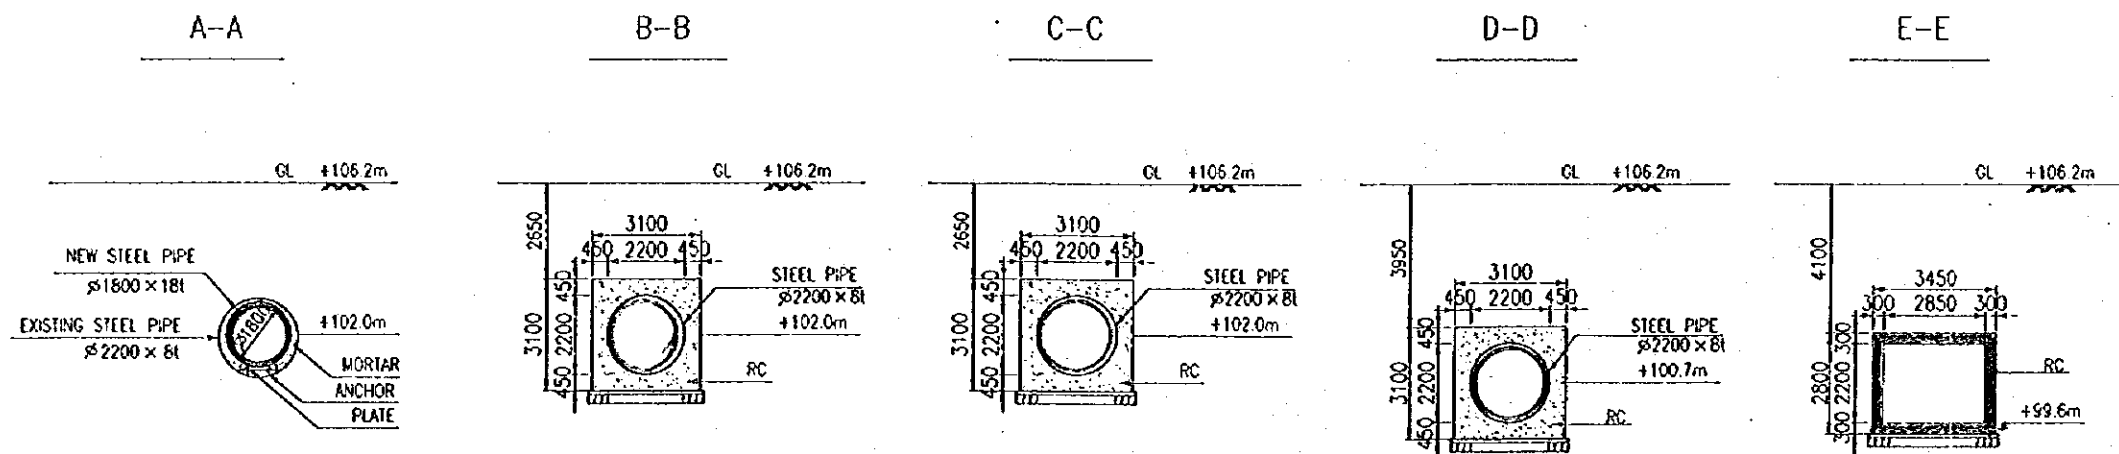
INTAKE AND DISCHARGE TUNNEL PLAN
